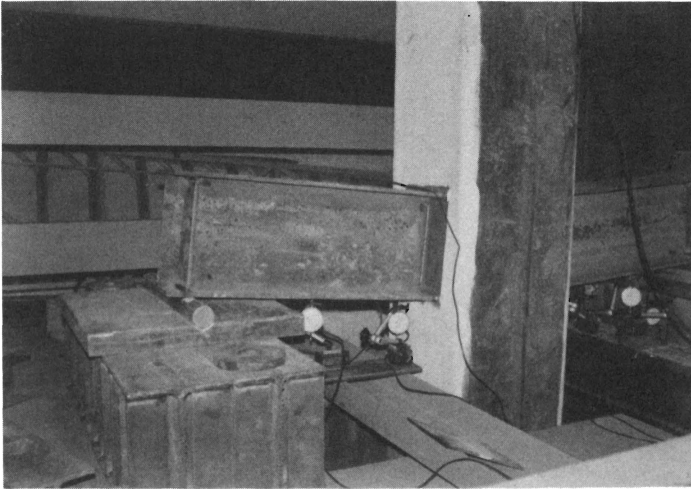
Failure Mode of Beam-Column Connections
